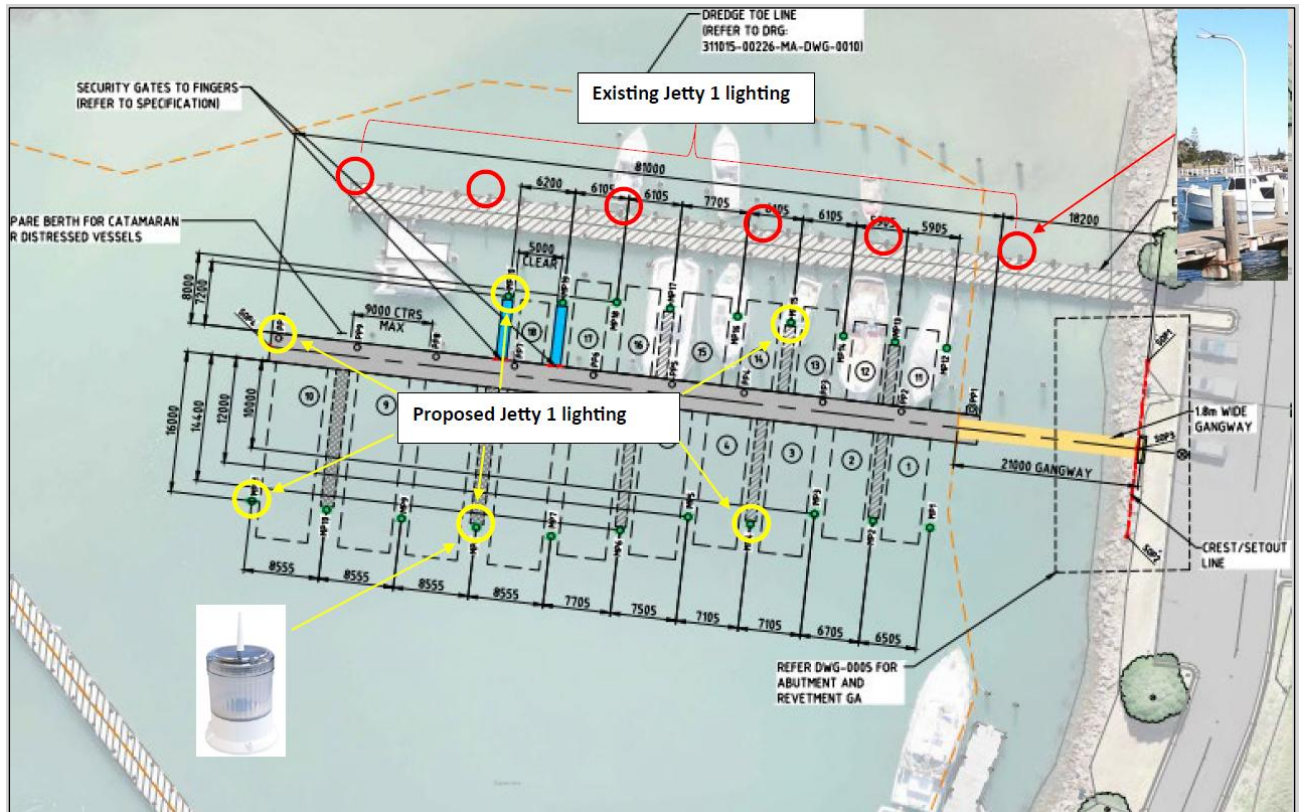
Proposed lighting on new Jetty 1 (Source: Transport)
